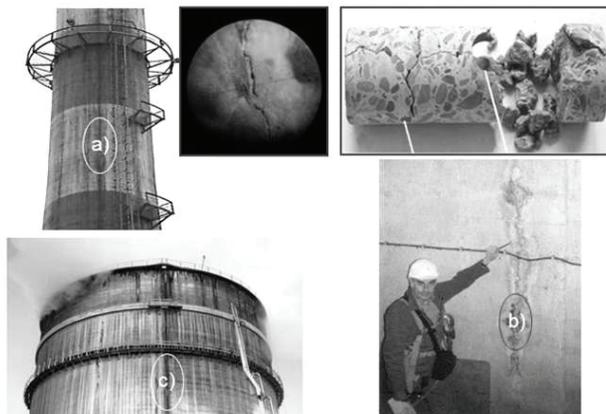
BACKGROUND, Impairment by Wide Cracks
